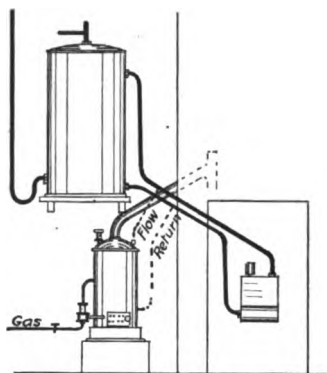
Connection of Gas Heater to existing Circulation Pipes.
